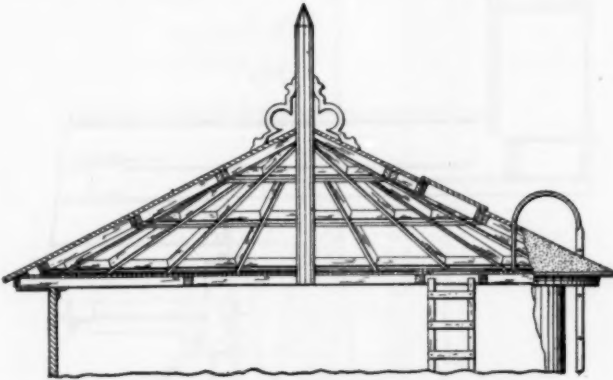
A GOOD DESIGN OF DOUBLE ROOF FOR ELEVATED TANK
